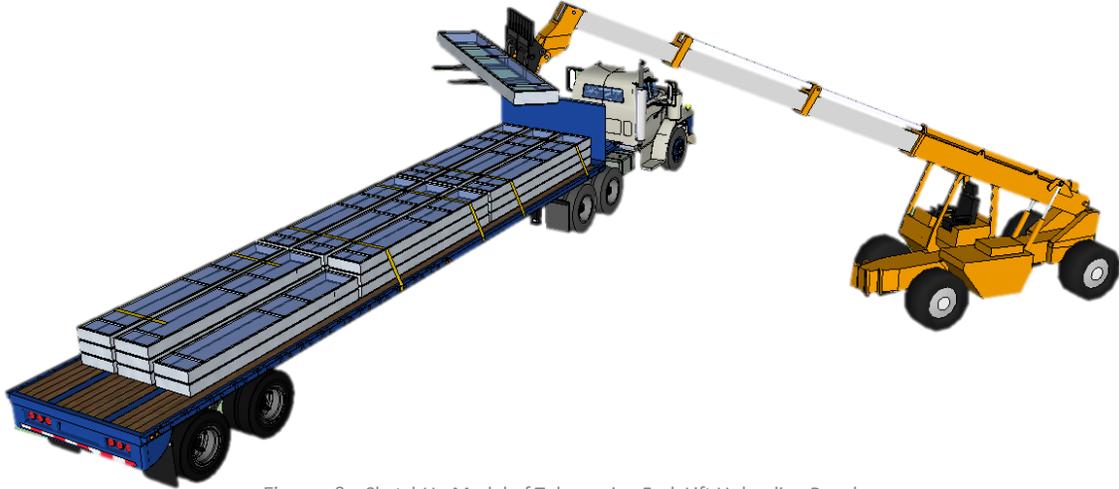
SketchUp Model of Telescoping Fork Lift Unloading Panels
